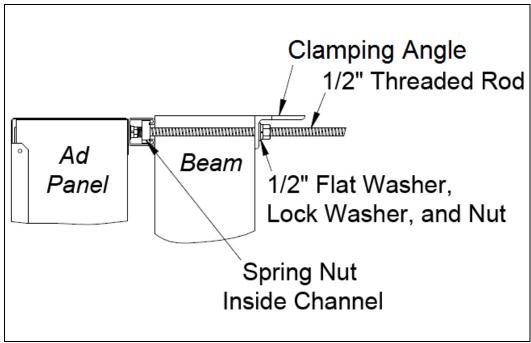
Ad Panel Mounting with Clamping Angles, Side View
